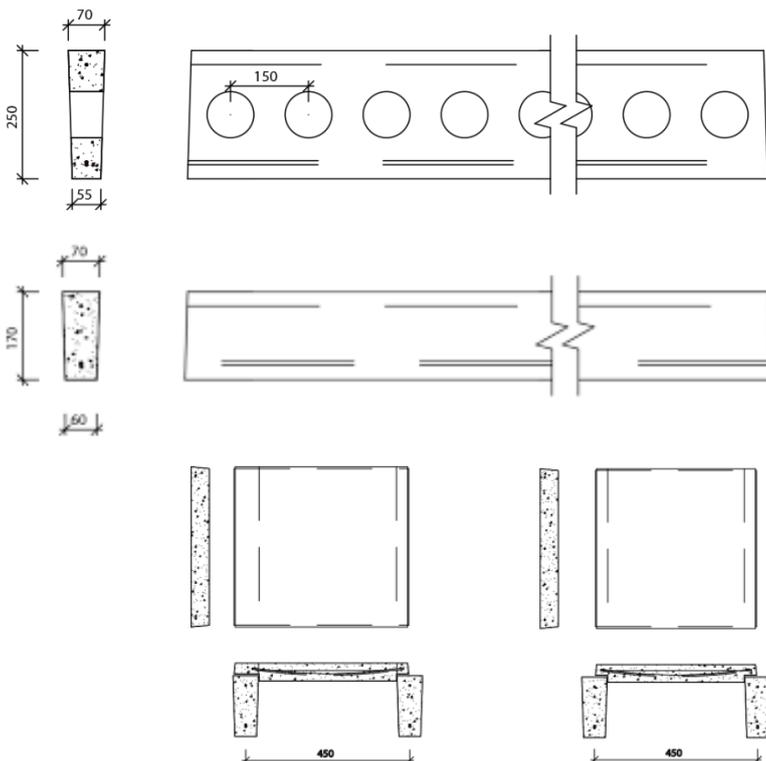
WinDeck components: 250mm prestressed beam; 170mm prestressed beam; concrete edge condition tile; standard 435mm x 435mm concrete tile (Wintec 1994)
